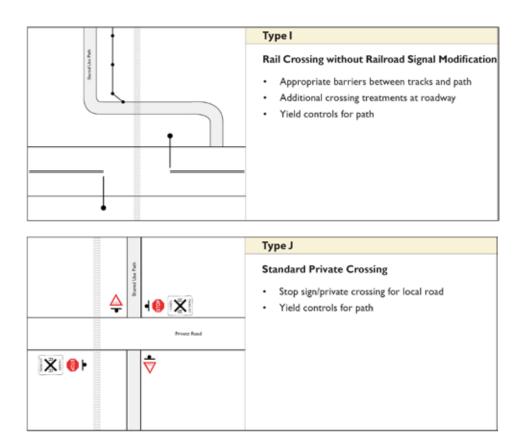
Detailed Roadway Crossing Concepts, Types I and J
